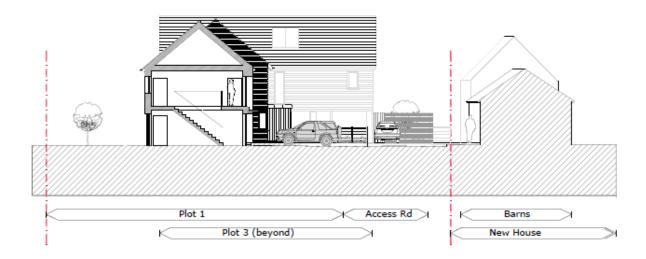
Proposed site section (east –west). New development is of a complimentary scale to the existing barns.
